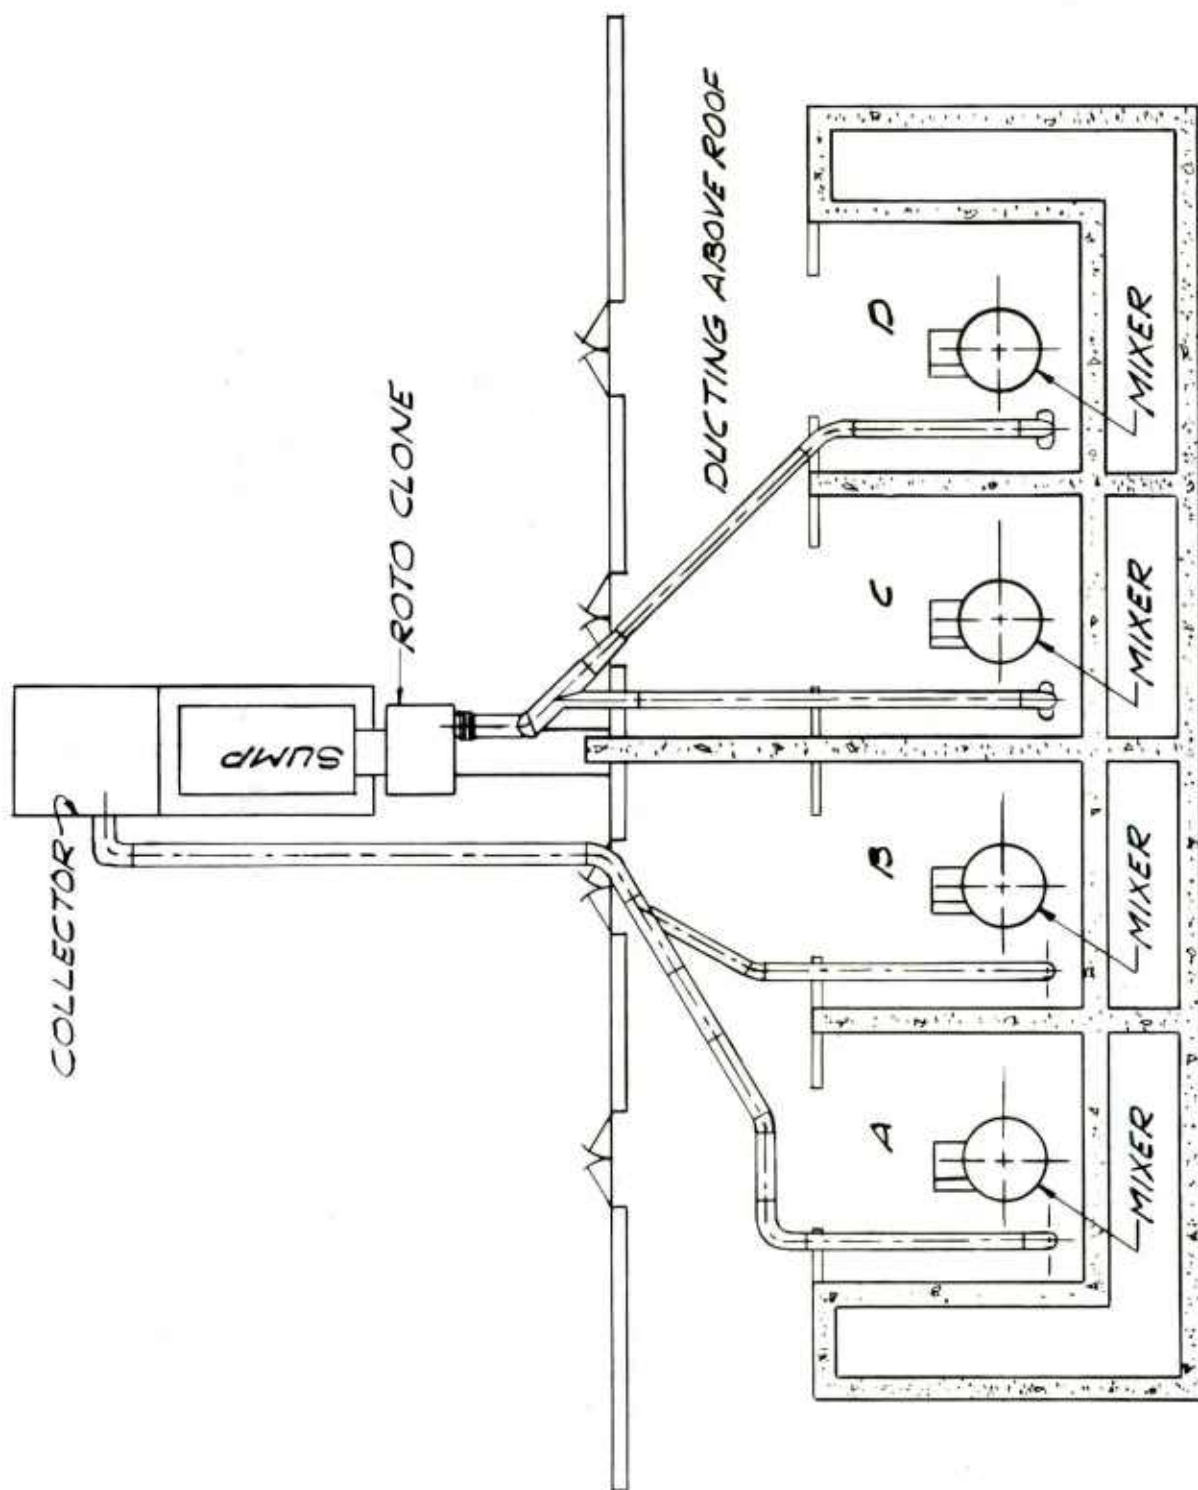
Partial Plan of Building B-II showing interconnecting ductwork, Longhorn AAP
